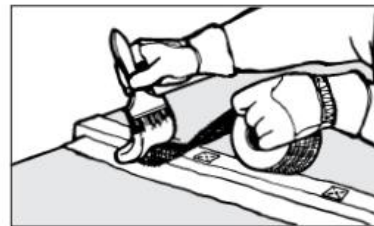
C. Glass fabric and mastic are used to seal equipment connections over mechanical fasteners applied to carry the mechanical load.
